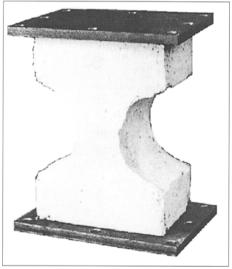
Dogbone concrete specimen glued to the thin platens.
